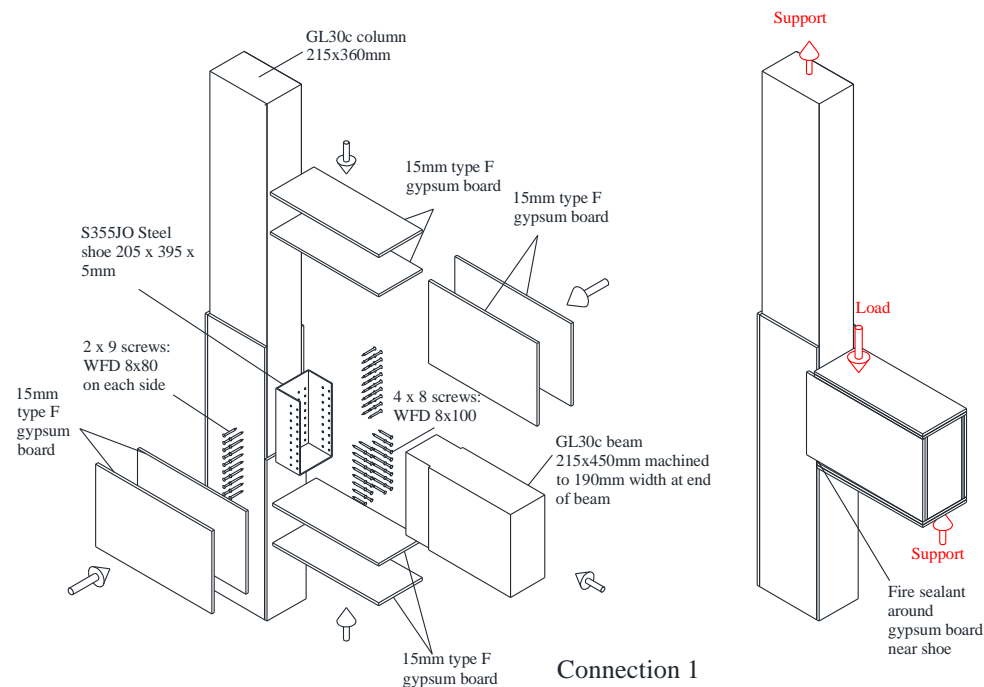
Exploded view of connection 1 (left) and assembled connection 1 (right)
